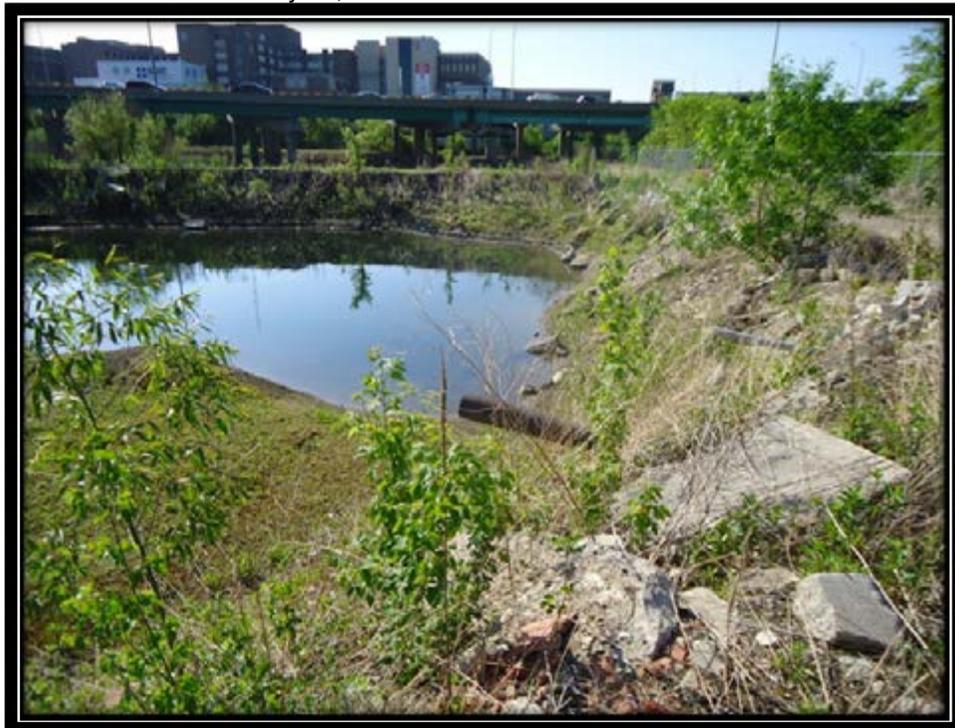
Sluice Pipe into Ash Pond 1 (note small trees in embankment)
